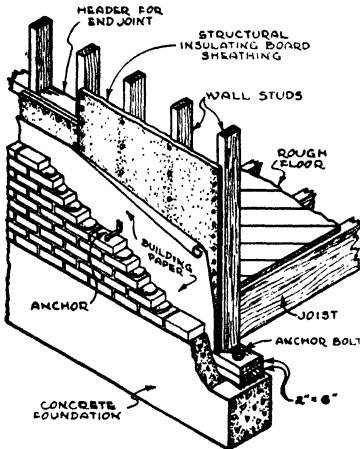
Structural Insulating Board Used as Sheathing under Brick (or Stone) Veneer
